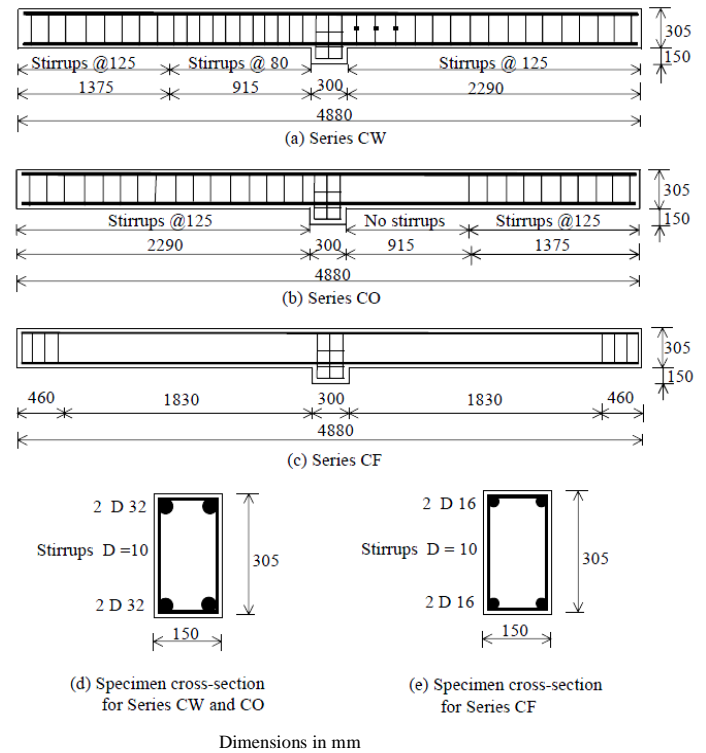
Beam specimens detailing and dimensions (Khalifa et al. 1999)
